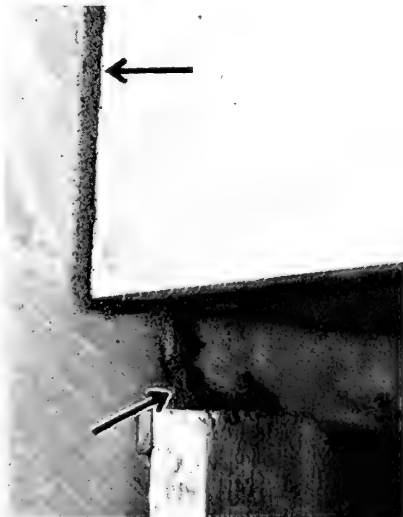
Termite tube extending from a wooden door frame up over the outside of a concrete beam to the wood timbers of a house. The figure does not show the wood above the concrete beam to which the tube leads.
